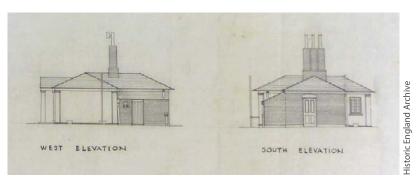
LCC drawing of the White Lodge's elevations, 1952
